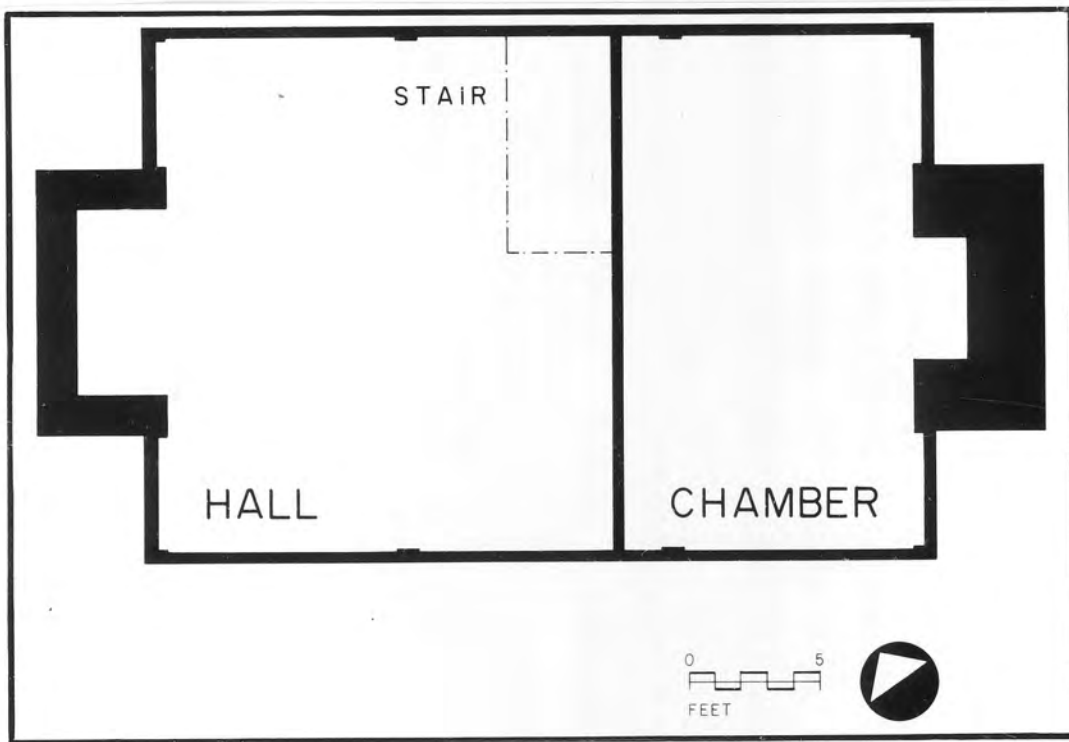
Matthew Jones House, first-floor plan of house in its original form.
